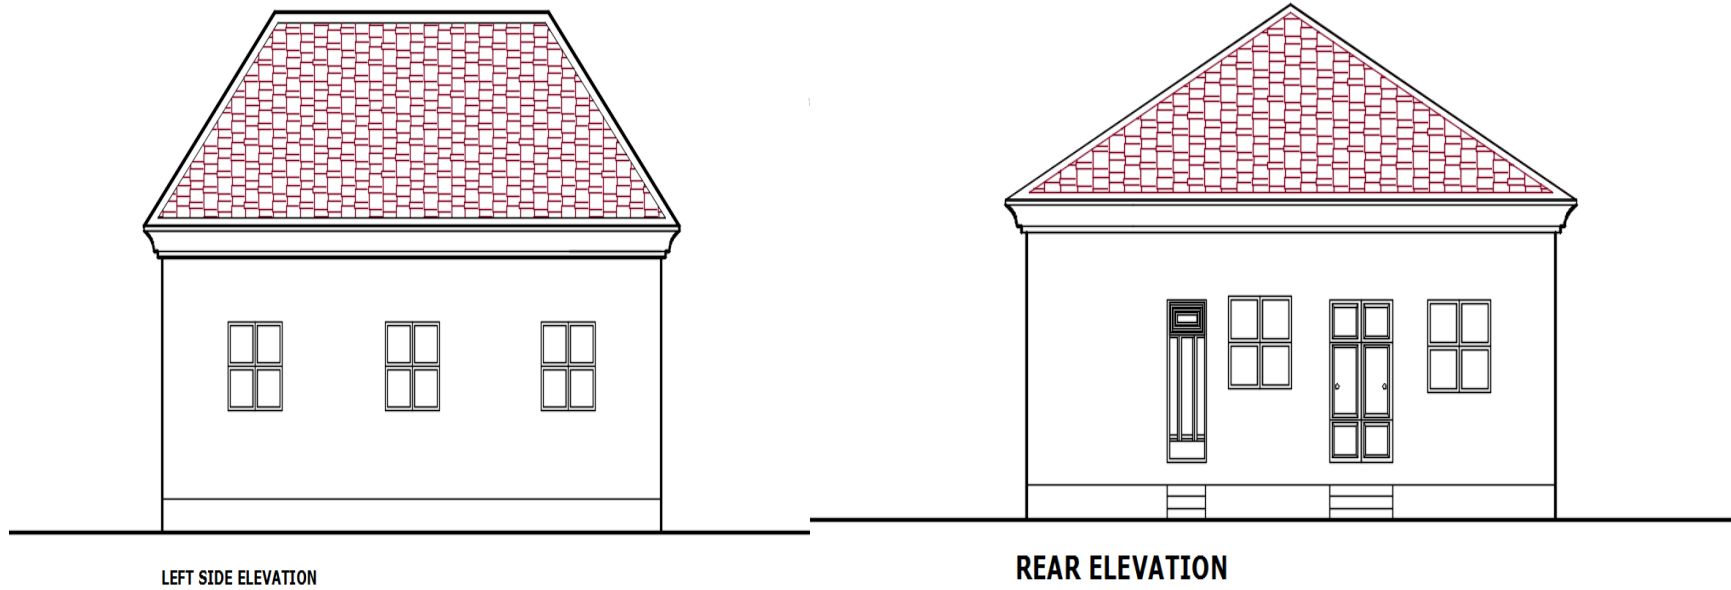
Detailed design of the switch room – left and rear elevations (all dimensions are in mm)
